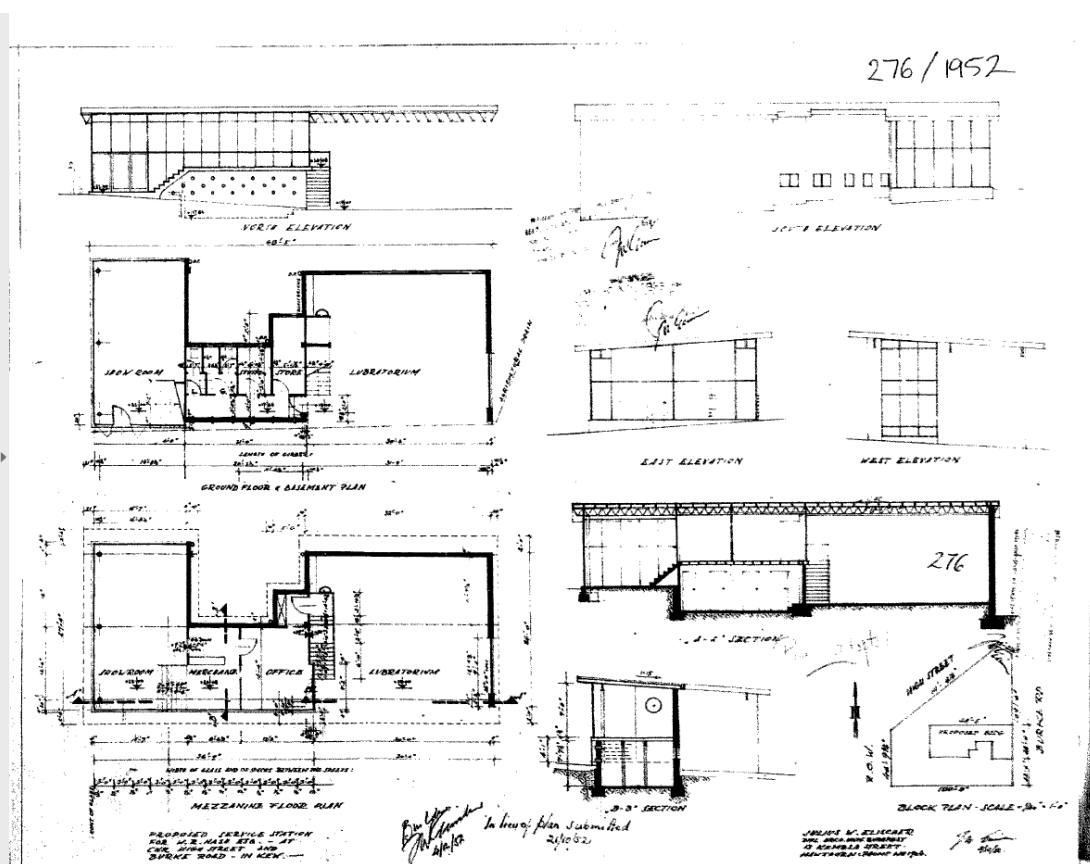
Drawing dated 1952 shows the elevations and site of the proposed service station (BP 276).
